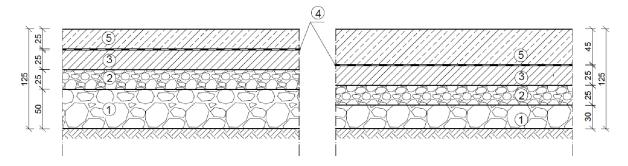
Fragments of runway cross-section, (a) in prestressed technology, variant I, (b) with dowelled concrete structure – variant II, where 1 – gravel, 2 – sand-gravel mix, 3 – concrete subgrade, 4 – sliding layer, 5 – surface layer [own study]
